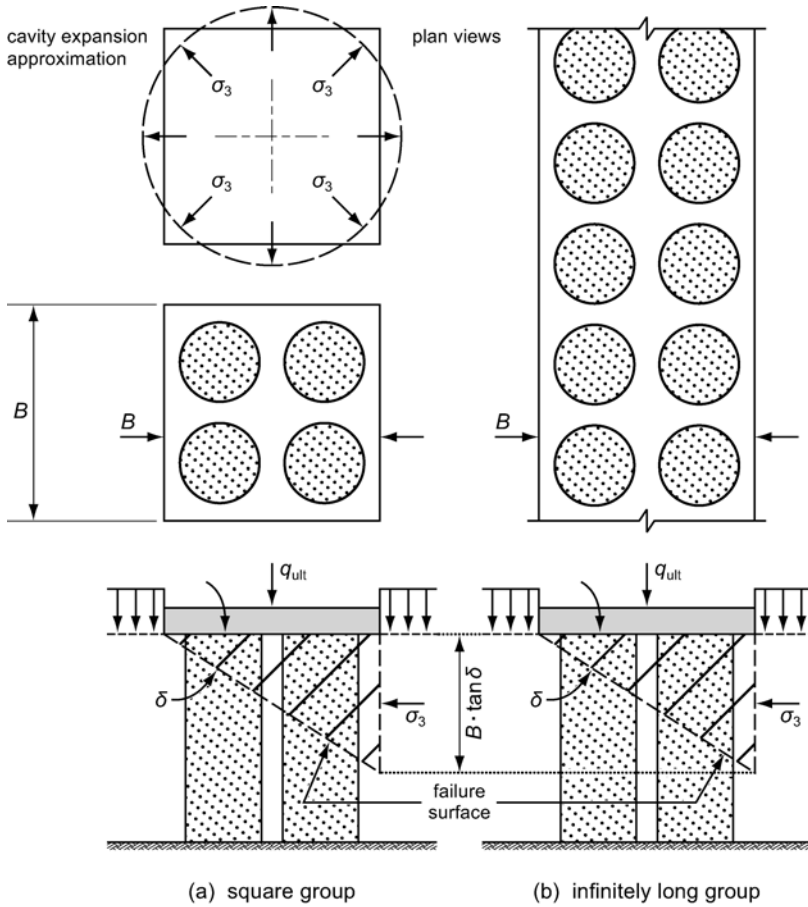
Bearing capacity of vibro stone column groups (a) below square footings and (b) long strip footings (according to Barksdale and Bachus, 1983)
